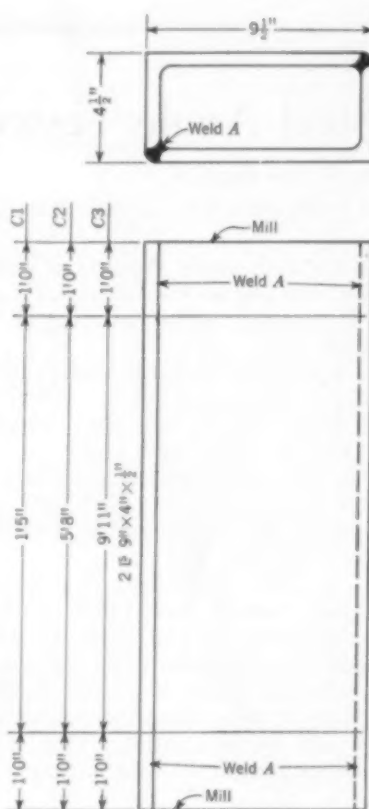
COLUMN TEST SPECIMENS OF NEW 9-IN. BY 4-IN. ANGLE
